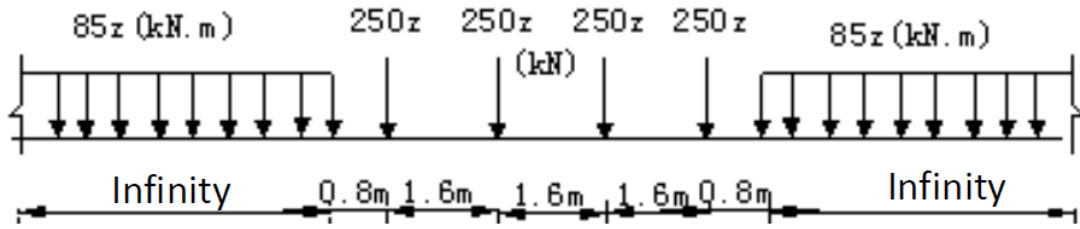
CR-live loading for heavy haul railway (Zhang et al. 2014).
